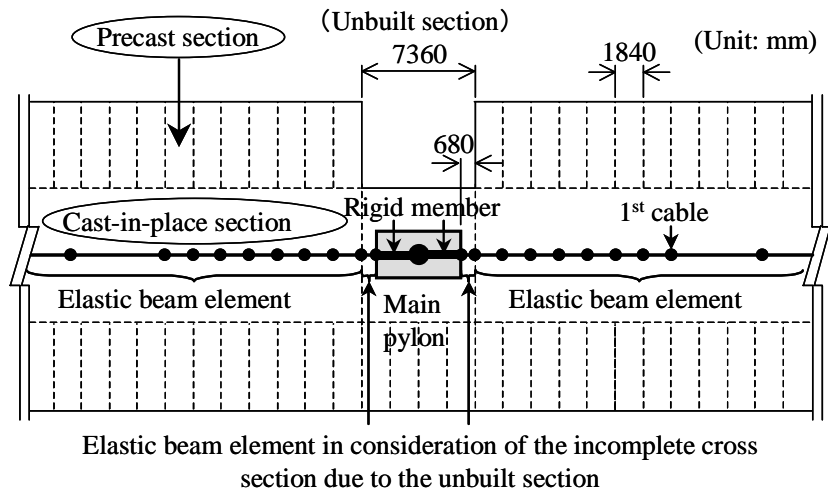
Modeling of the rigid connection section of the main girder and the main pylon (Plan view)
